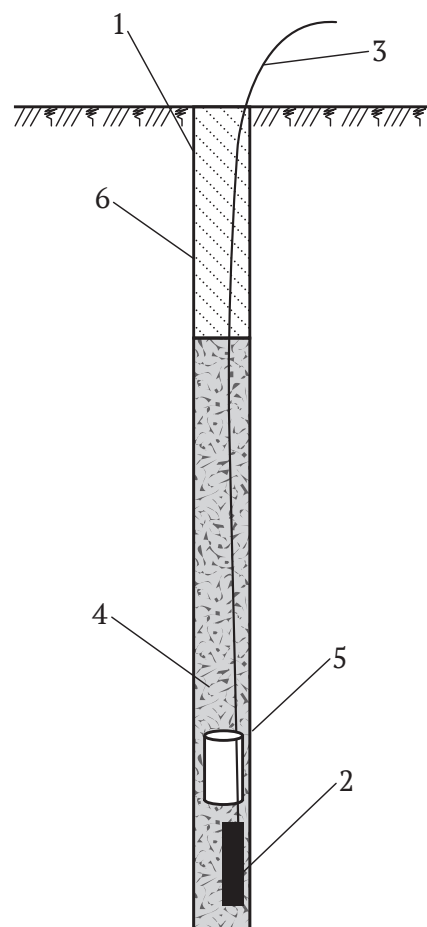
Design of a blasthole explosive charge with a turbulator for rock mass fragmentation:
